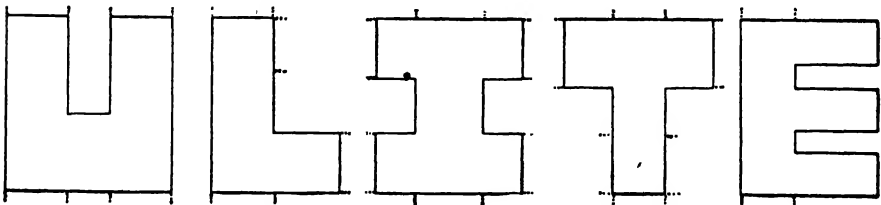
Ground Plans of Industrial Buildings Indicating Possible Directions of Expansion.
